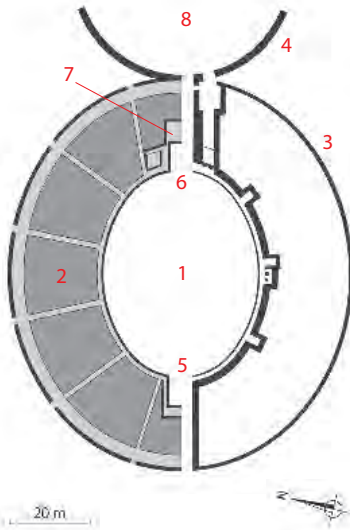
Amphitheatre. Plan of the first construction phase (early 2nd century AD). Left, elevation; right, foundations.
